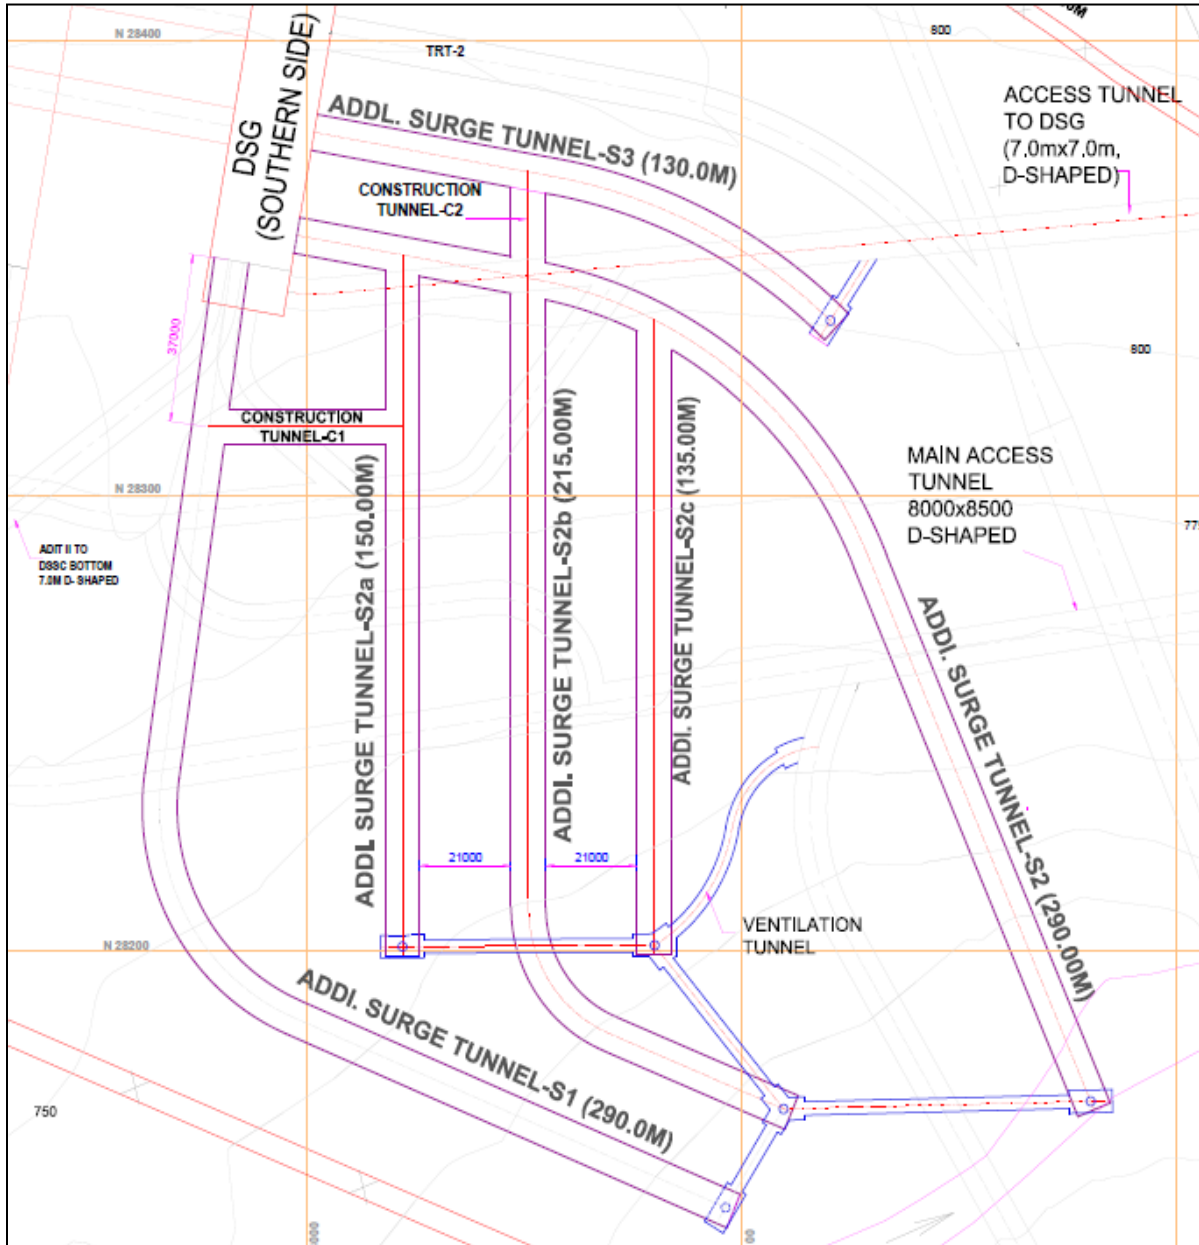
Additional Surge Tunnel Layout Plan AT DSG Southern End
